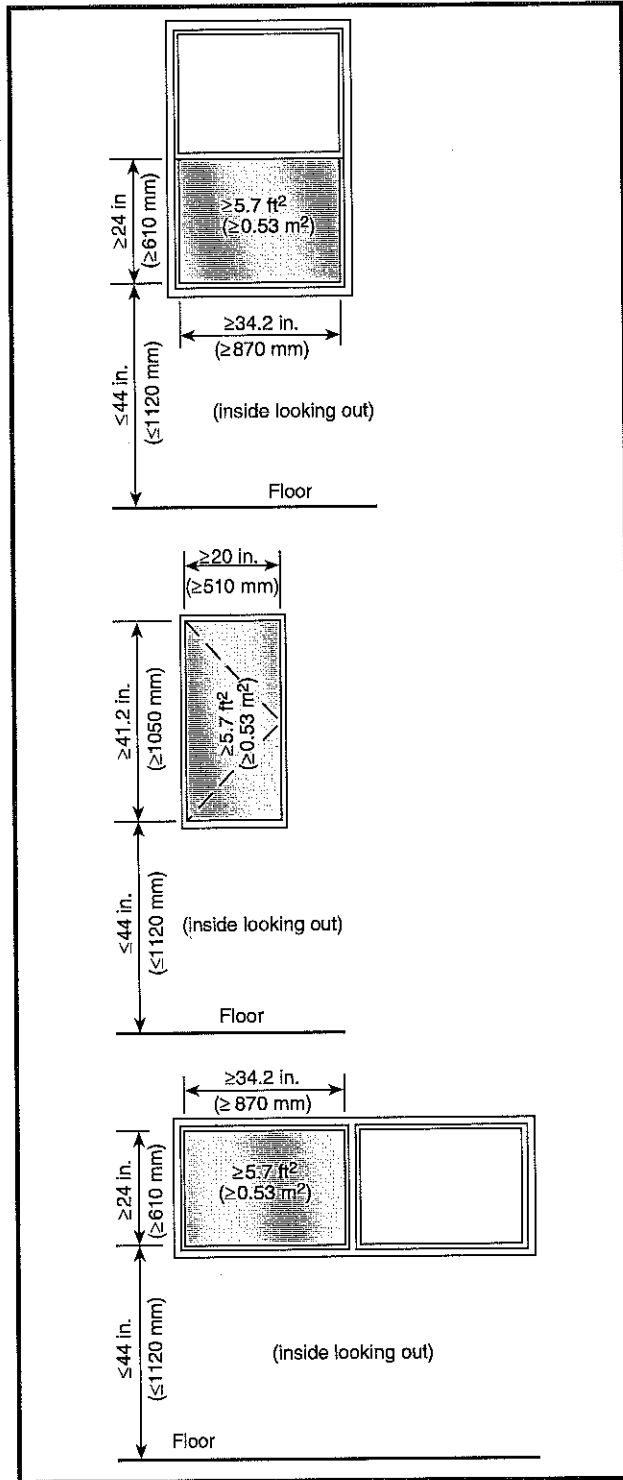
Alternative secondary means of escape arrangement complying with 24.2.2.
